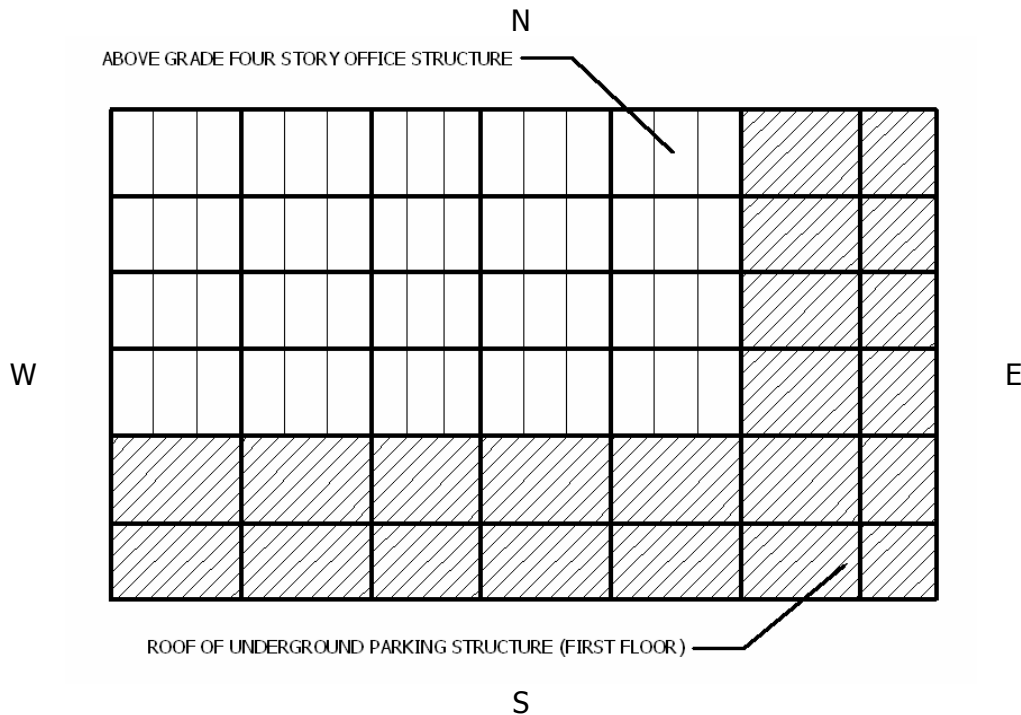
Simplified Floorplan with Office Building and Parking Structure illustrated.
